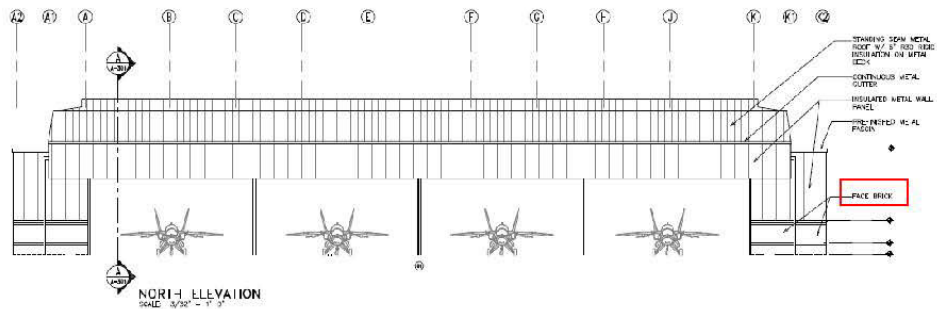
Image showing the proposed hangar door configuration, showing four bays, retaining an articulated pattern. The note indicated in red, which is shown on the 35 percent design plans, indicated that brick veneer would be installed; however, that design element has been removed to avoid impacts to the historic property.
